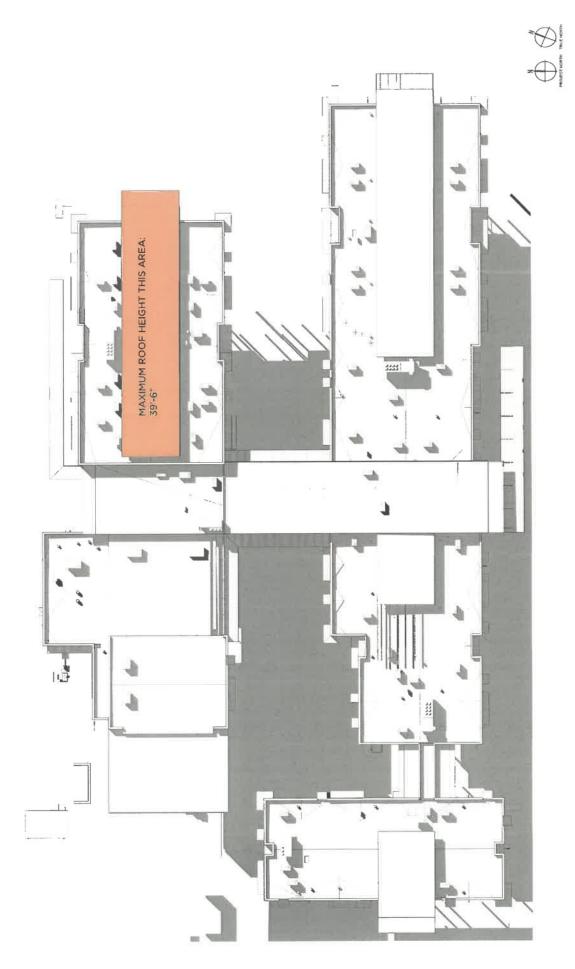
EXHIBIT B - ROOF HEIGHTS Elementary School #8
